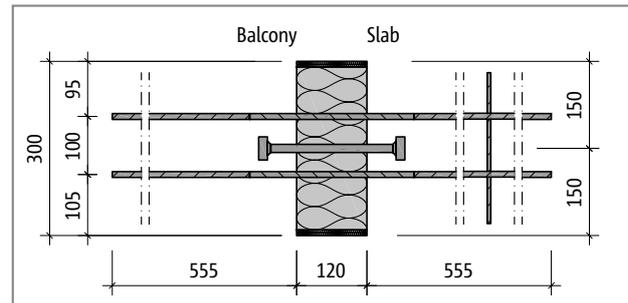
Schöck Isokorb® XT type Q-P-V1: Product plan view
